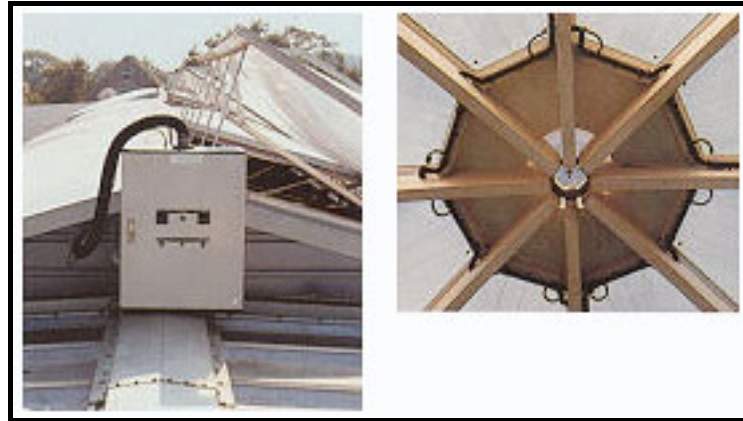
Inflation Equipments Mounted On Roof Structure
